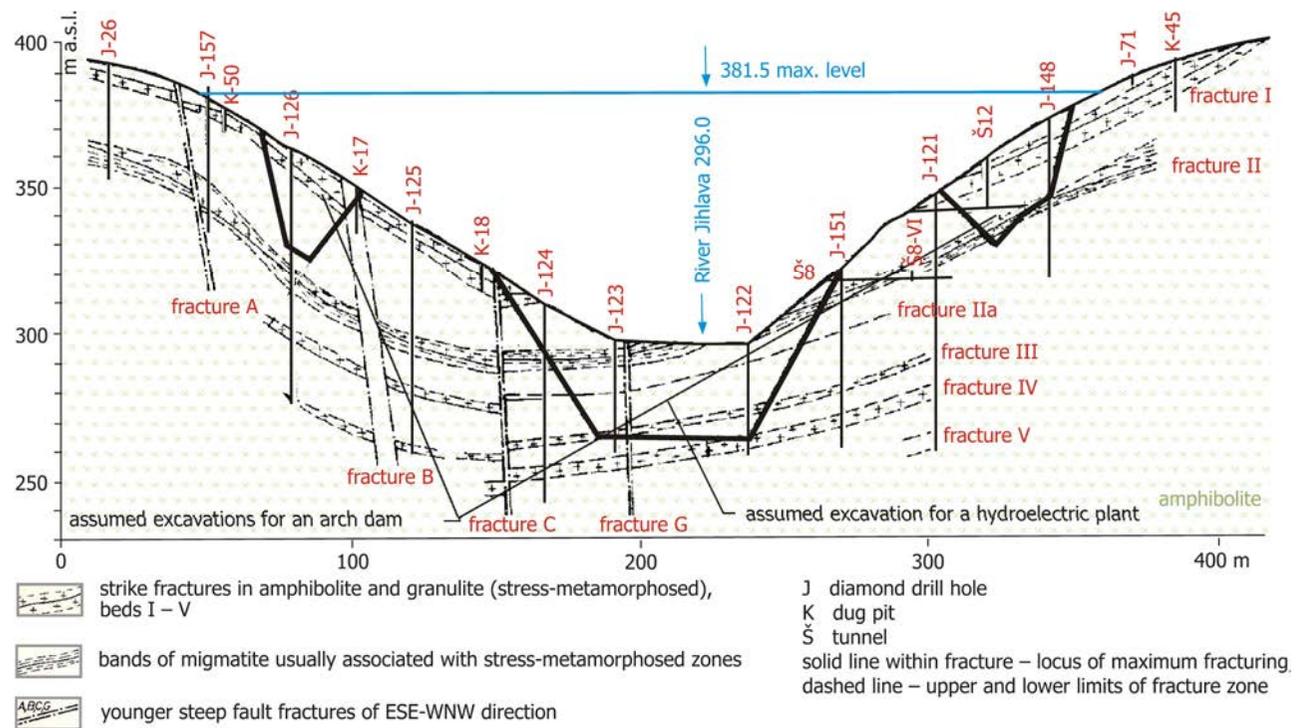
Survey work in the Dalešice dam profile for the option of an arch dam
